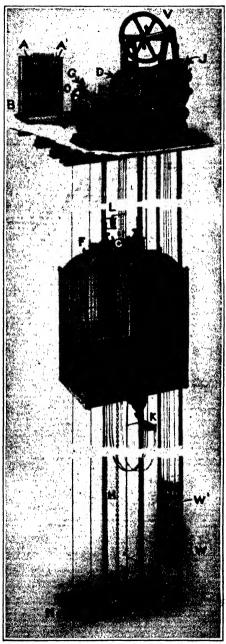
Typical overhead installation of drum-type elevator machine.
